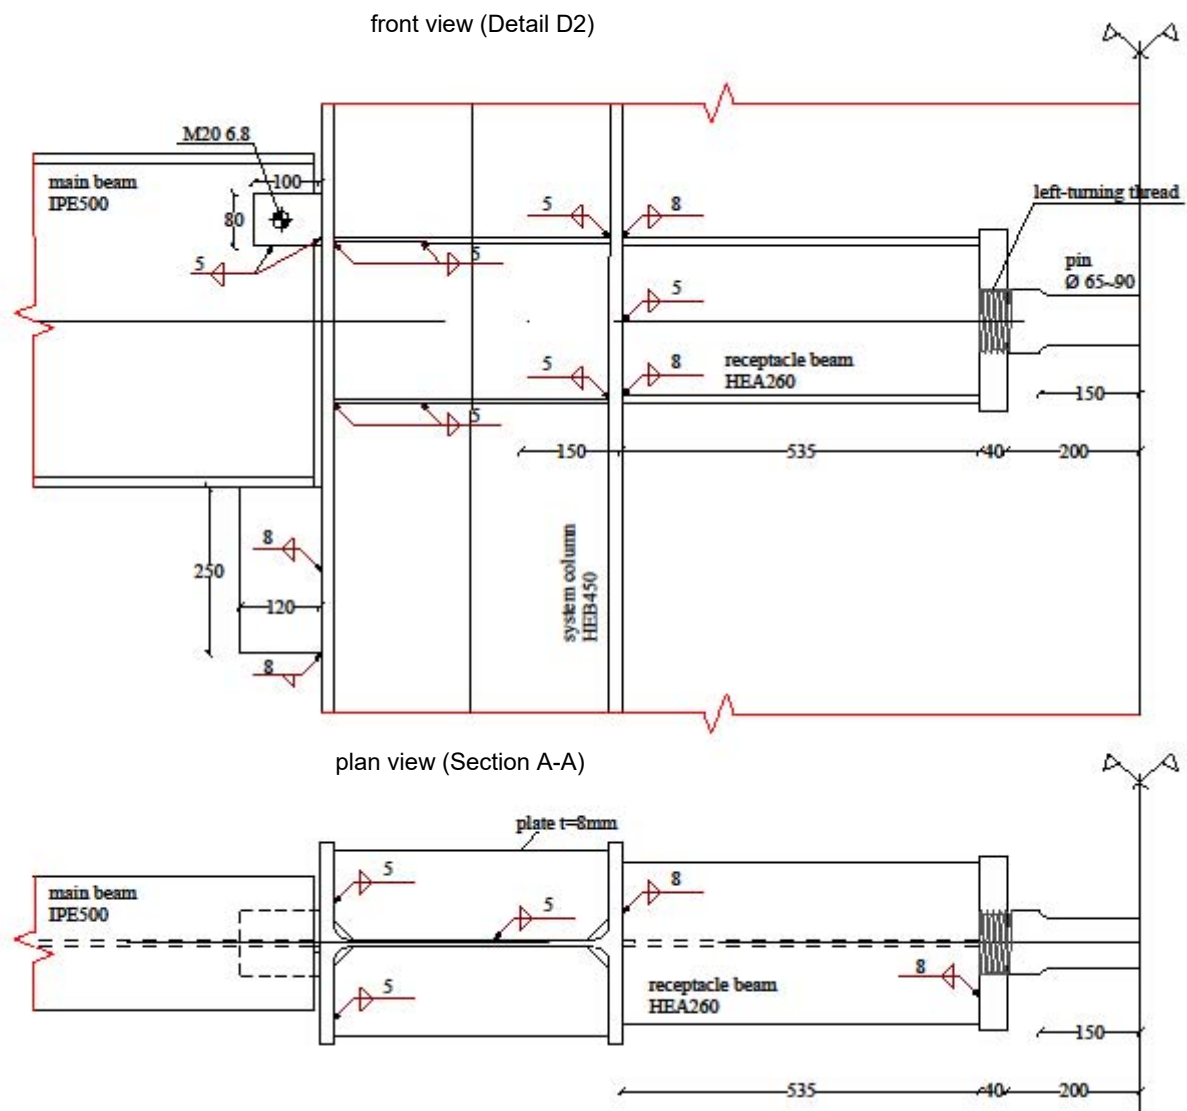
Side view and plan view of a typical FUSEIS horizontal link
